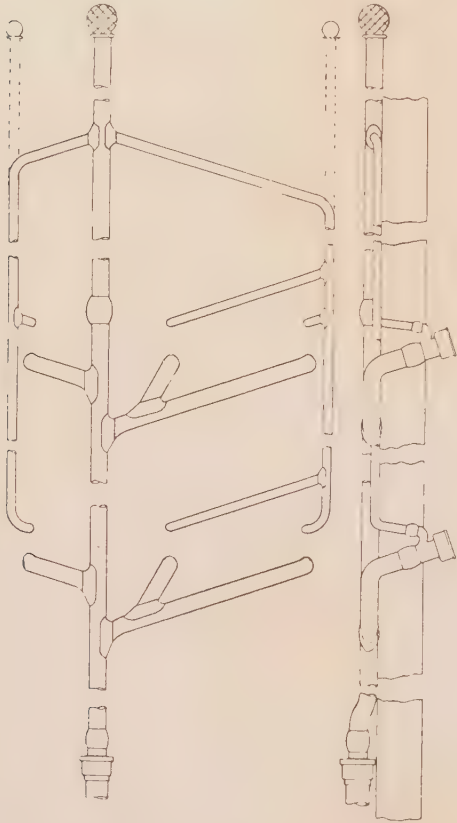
Arrangement of Soil and Ventilation Pipes.
